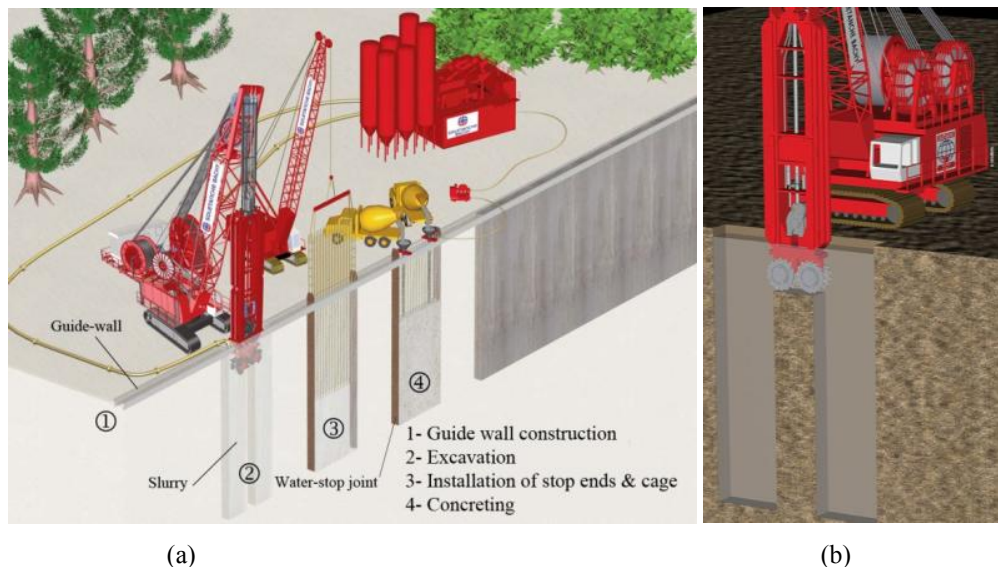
The process of (a) diaphragm wall construction and (b) excavating a panel
